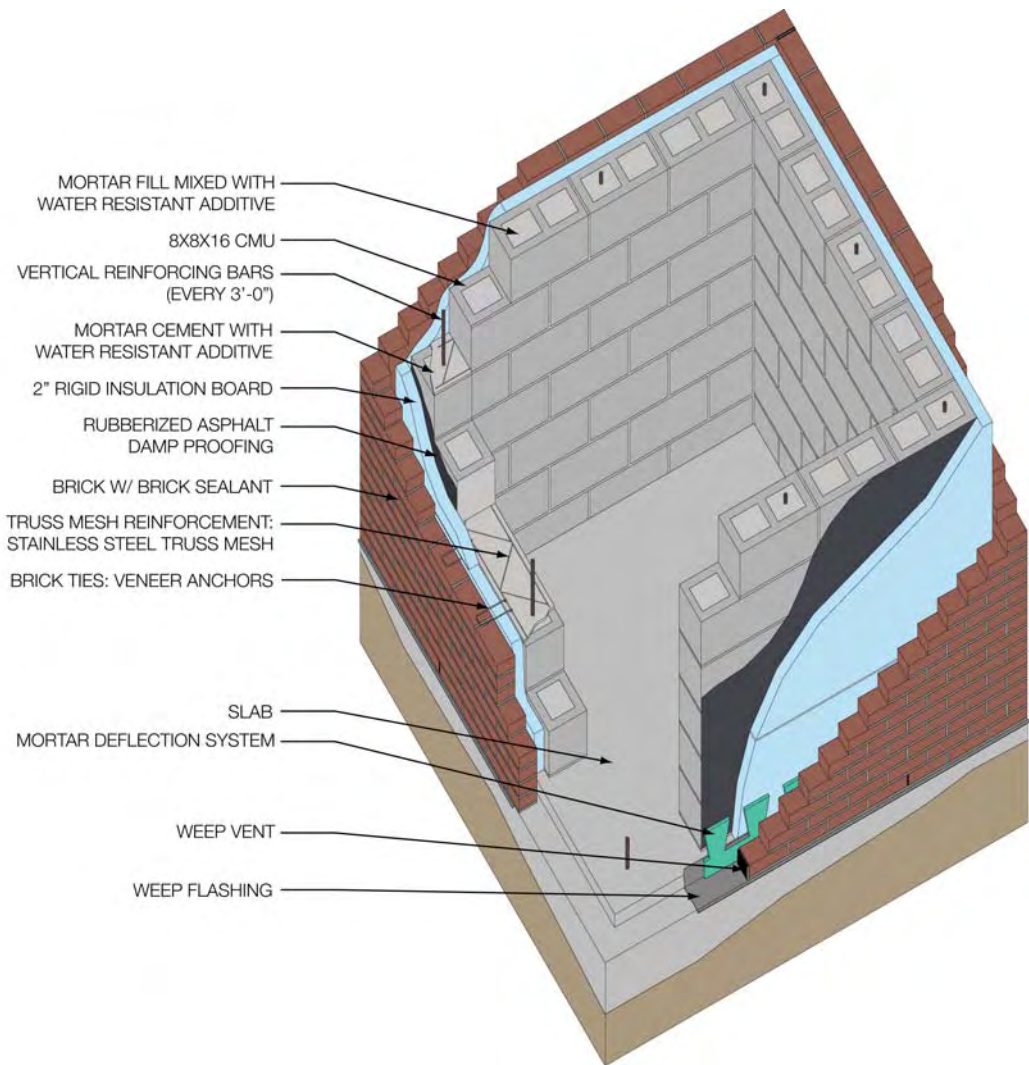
DIAGRAM: test pod B2: cavity wall filled block.
